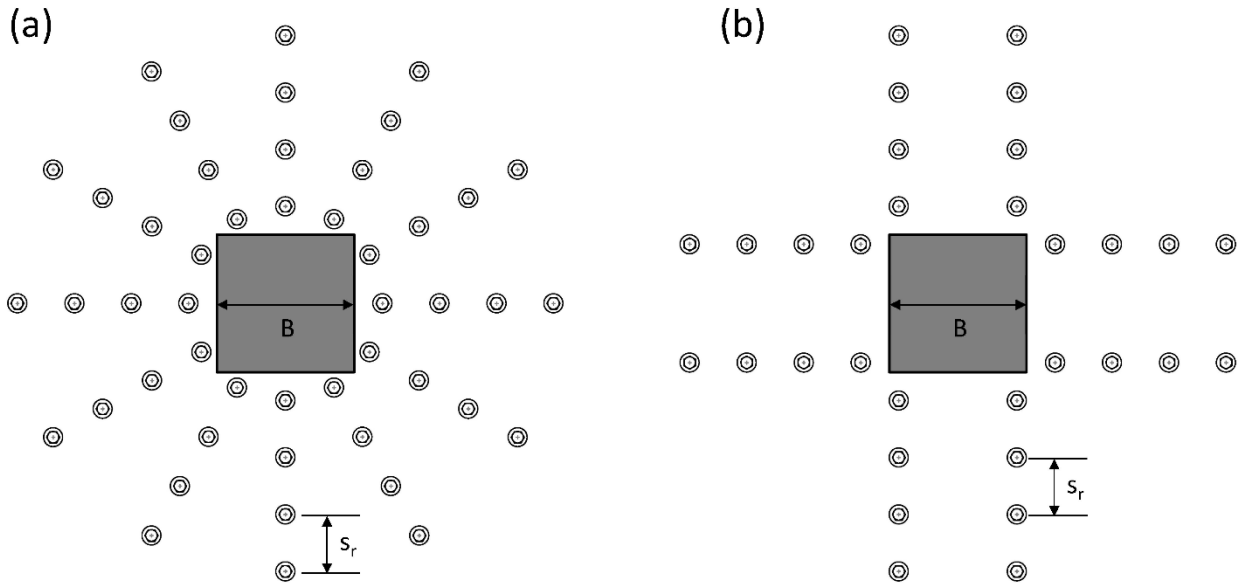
Shear reinforcement arrangements: (a) radial arrangement (b) orthogonal arrangement
